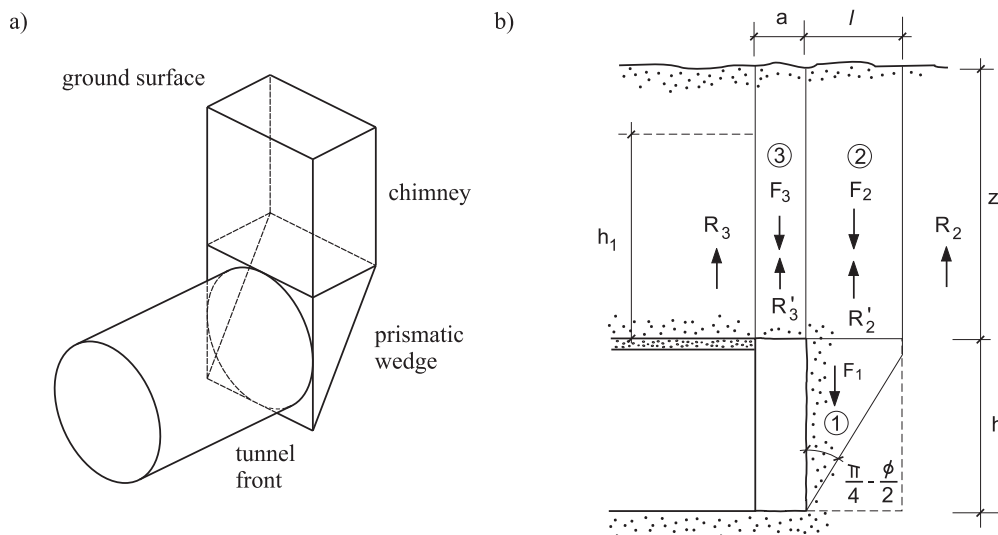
Limit equilibrium models for analyzing the stability of tunnel fronts for a) unsupported tunnel (after Horn 1961); and b) supported tunnel (as reported in Cornejo 1989 —see also Tanzini 2001).
